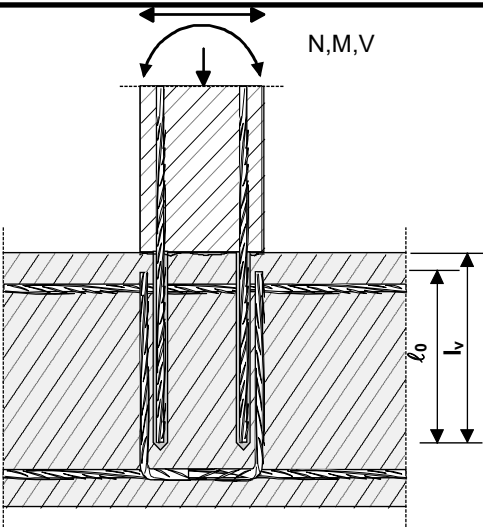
Overlap joint with existing reinforcement at a foundation of a column or wall where the rebars are stressed in tension
